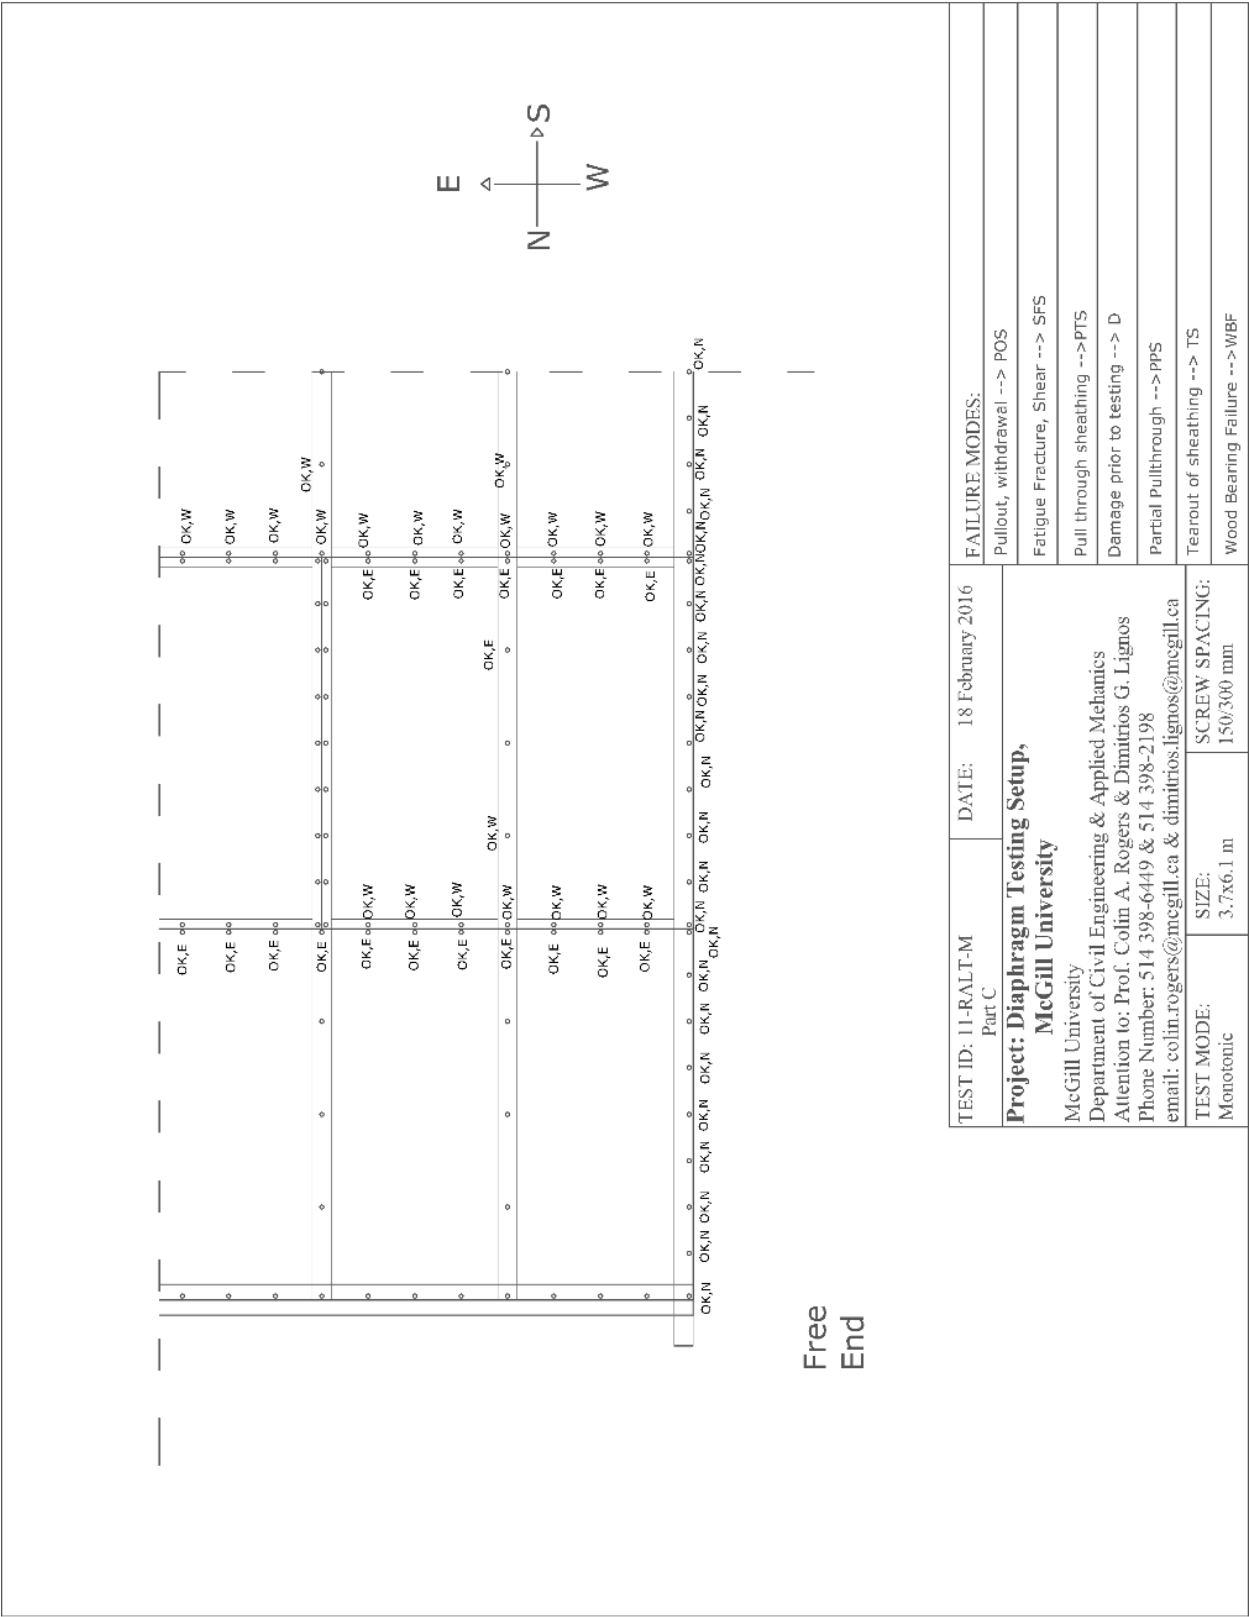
Sheathing Fastener Failure Modes Part C Specimen 11-RALT-M
